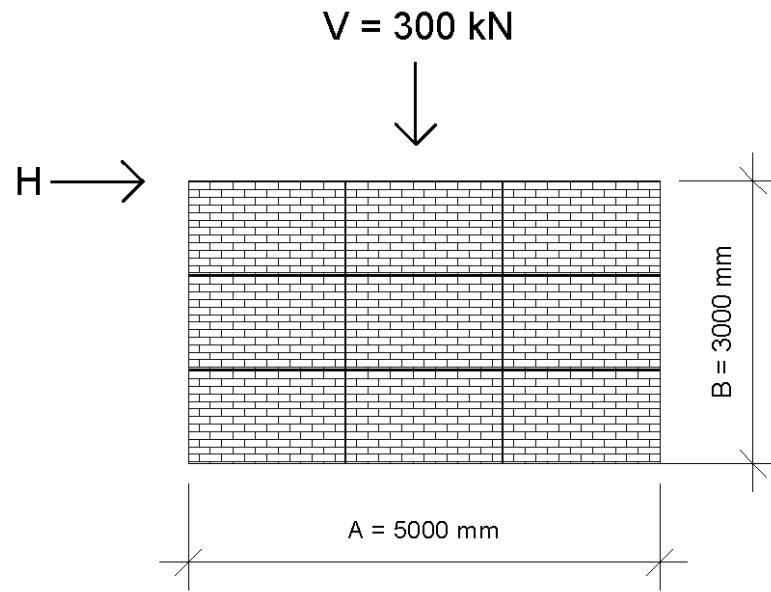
Masonry wall with no opening under vertical stress (500x300 cm)
